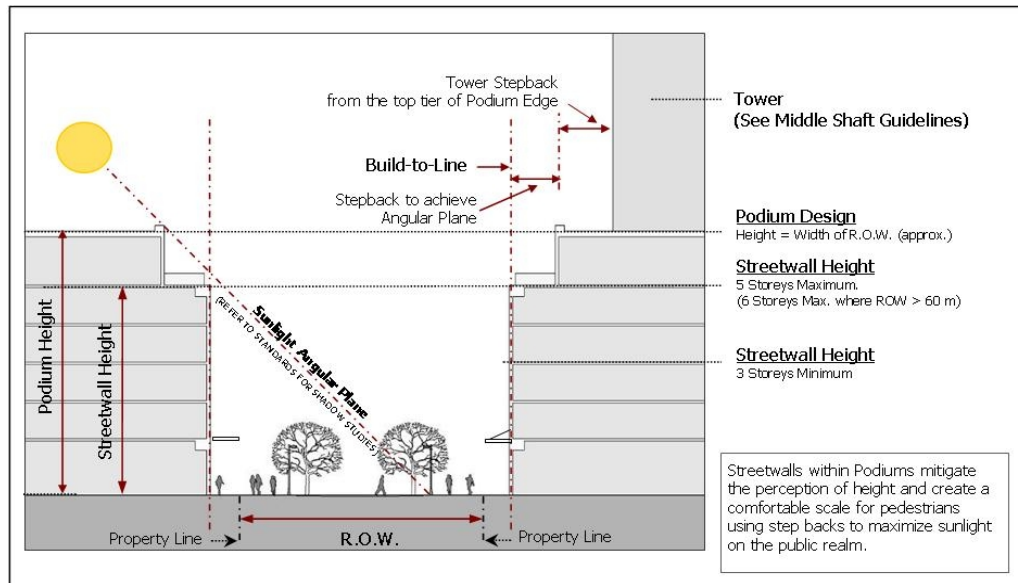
Podiums and their streetwalls will be designed with stepbacks at the upper storeys to provide light filled sidewalks and boulevards in the Downtown Core.
